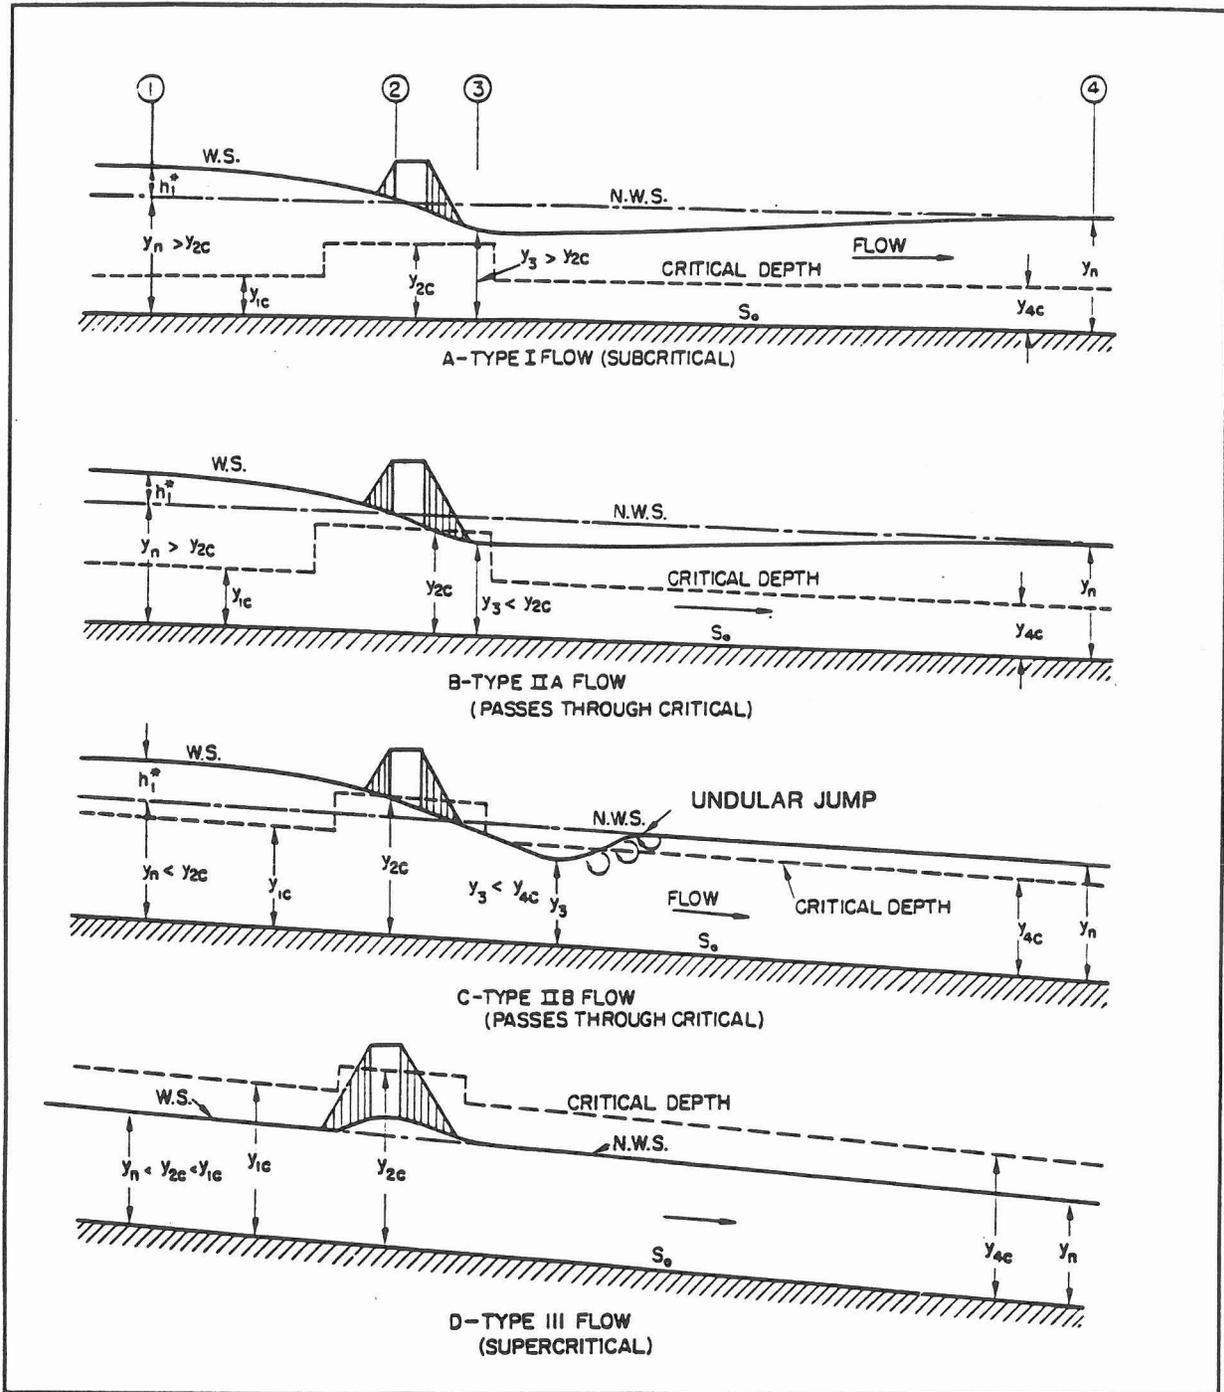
Types of water surface profiles through bridge openings (After [19]).
